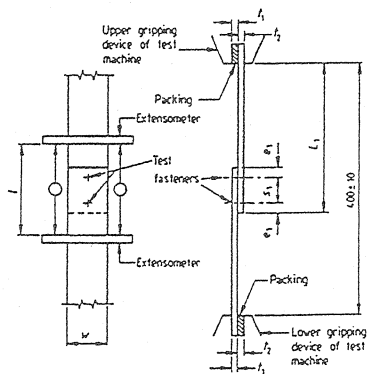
Test Set-up recommended by Davies and Bryan (3)
